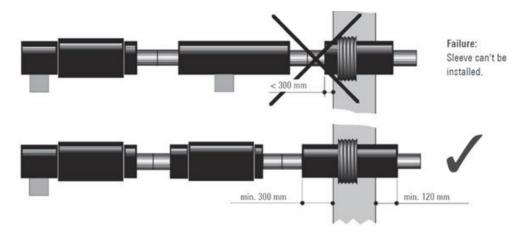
Fixed point connection point of the heating and cooling network of the local building
